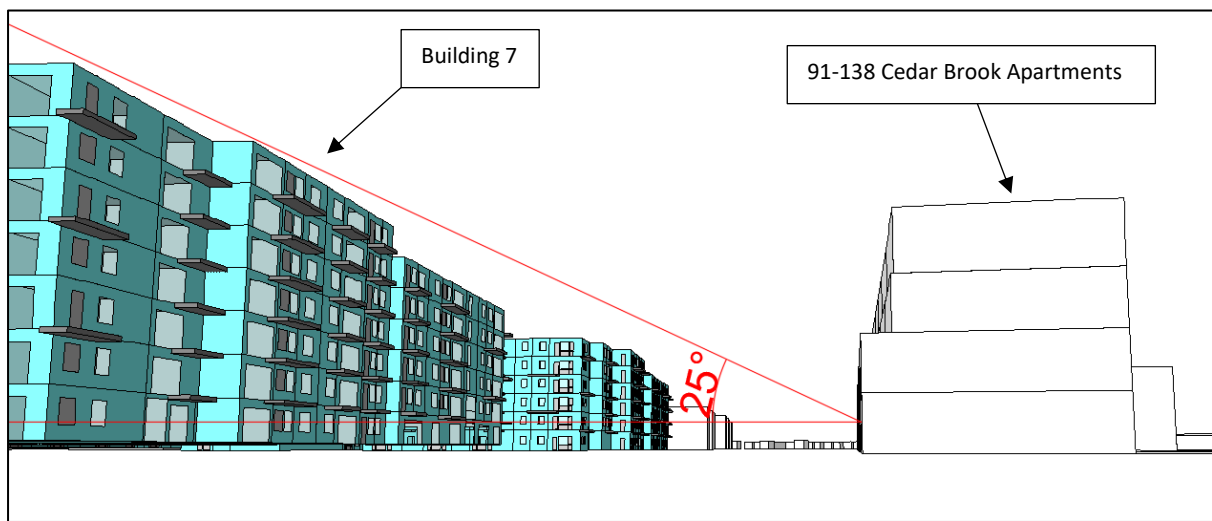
Section in plane perpendicular to the affected window wall of Cedar Brook Avenue (91-138) facing northwest
